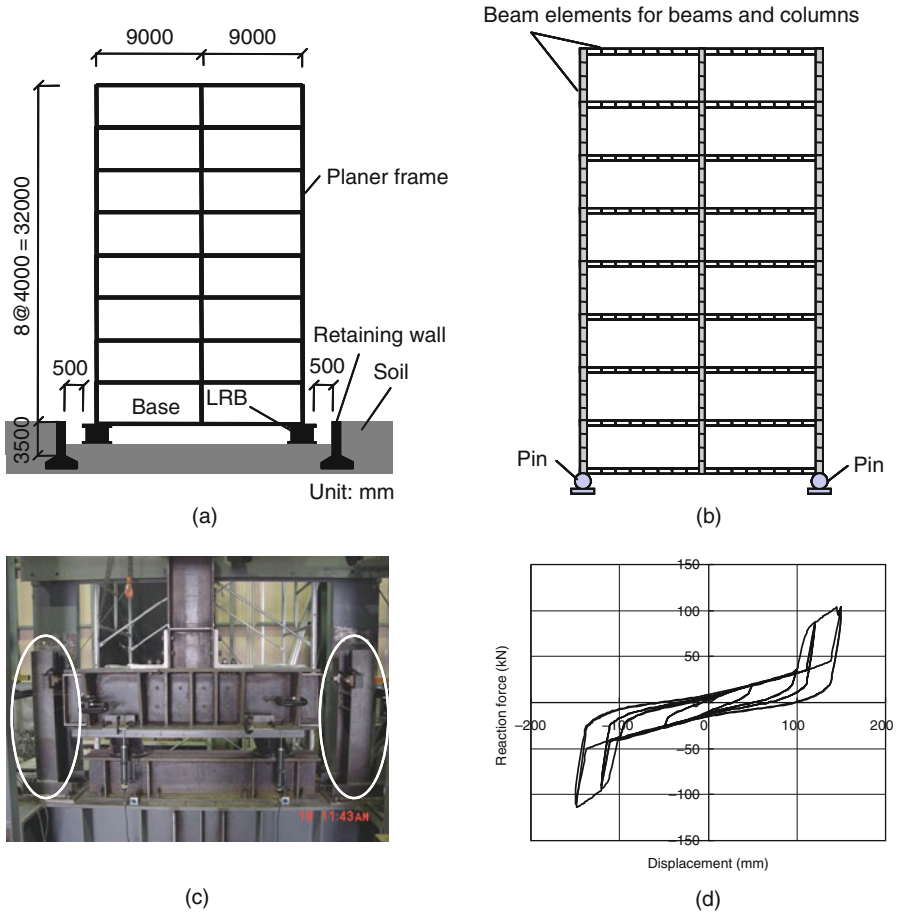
Demonstration test using dual-model framework: (a) base-isolated structure with retaining wall; (b) superstructure model; (c) test specimen; (d) test results
